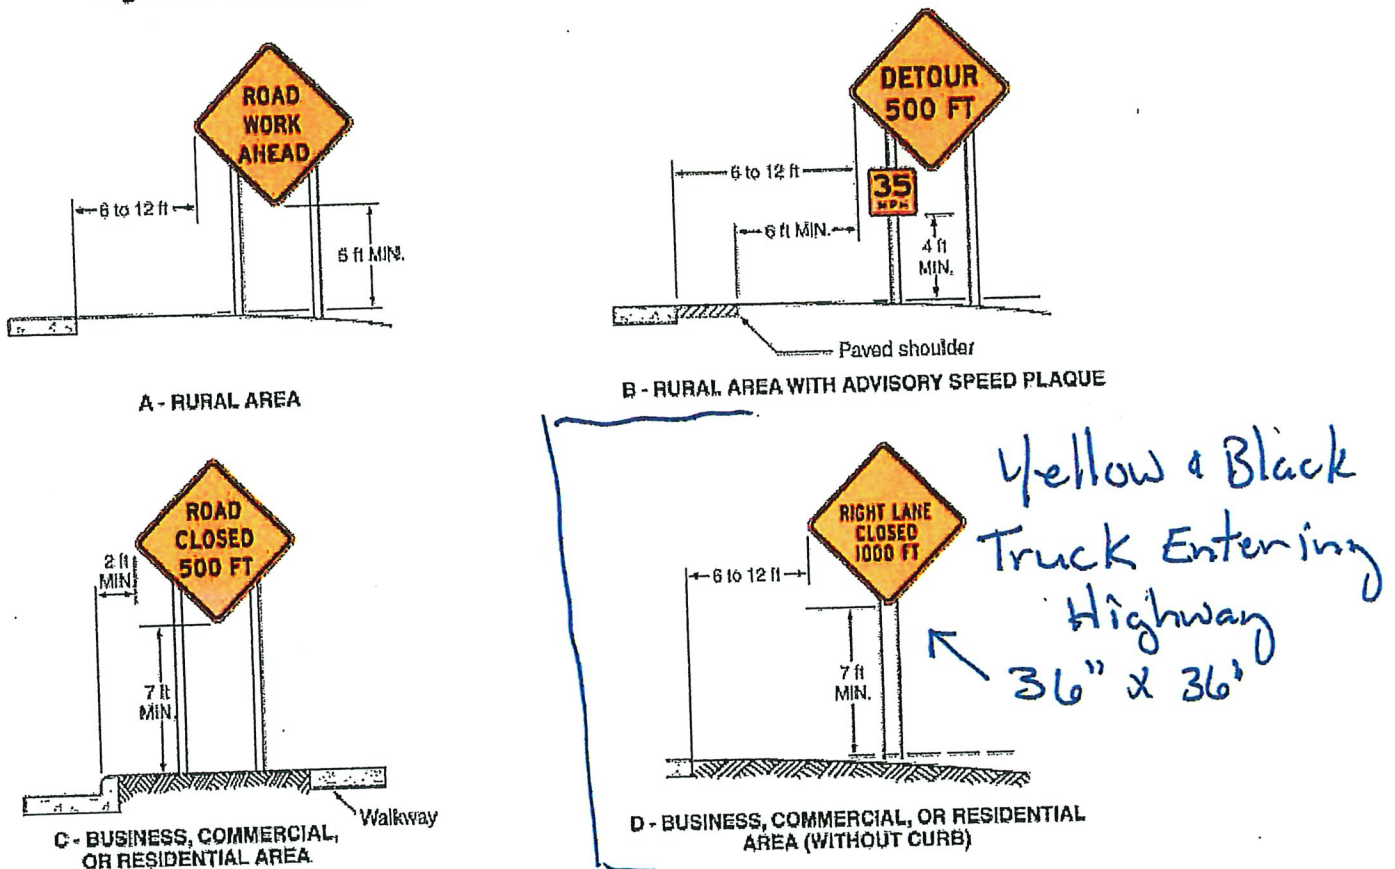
F-1. Height and Lateral Location of Signs—Typical Installations
